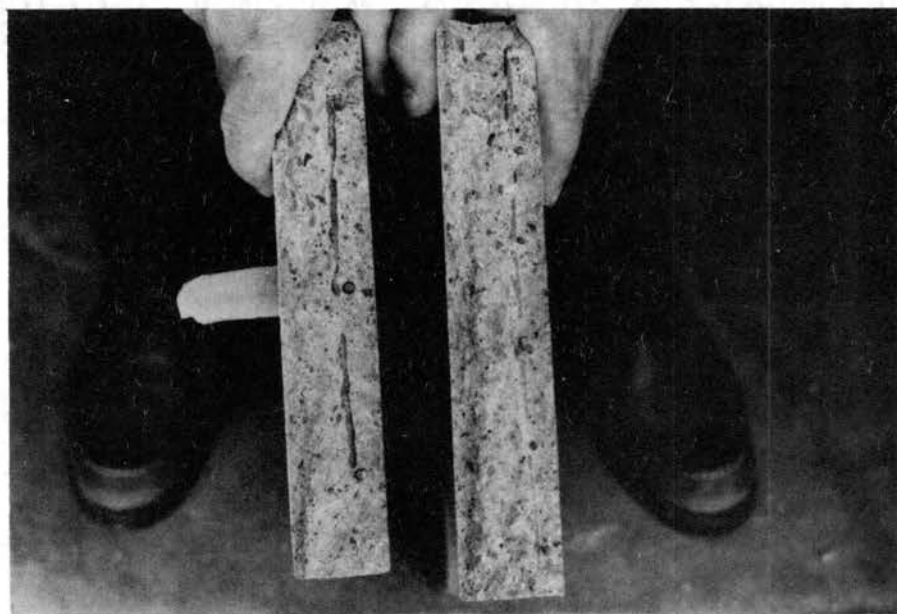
Failure of Panels With Number 6 and 10 Wires With Failure at Crosswires. Failure was outside weld, as shown in the picture.
